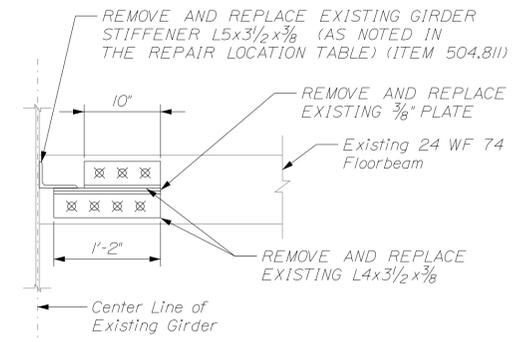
FLOORBEAM KNEE BRACE TYPE B PLATE
